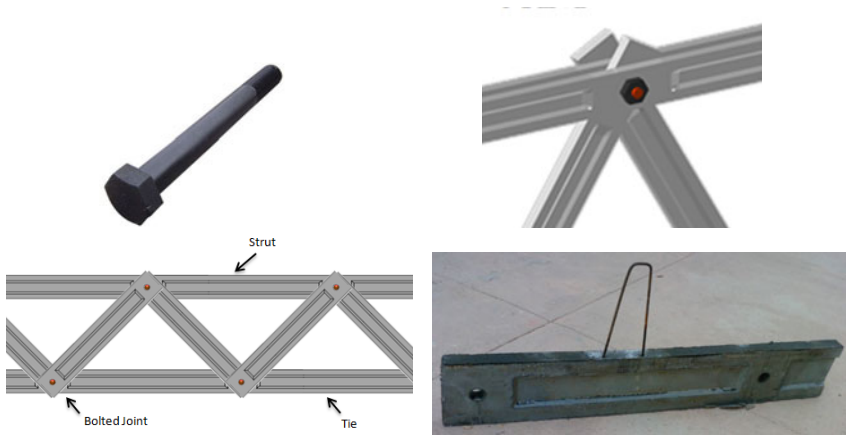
Example of a screwed joint in UHPFRC truss structure
